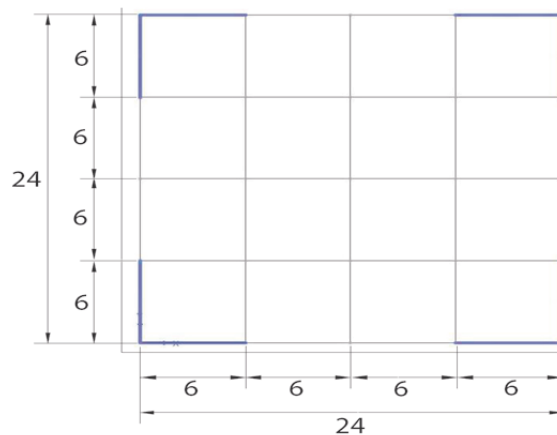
Plan View of the Structure with the Location of Bbracing Frames (SAP 2000).
